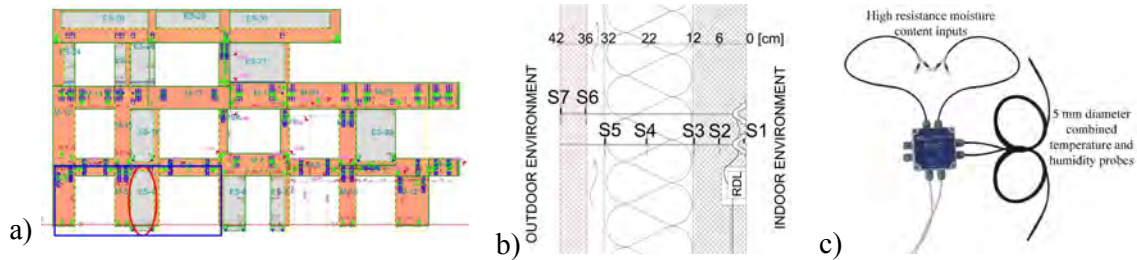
Measurement location: a) Position plan for southern façade; b) Arrangement of T-H sensors within panel layers; c) RDL Client-THR system
